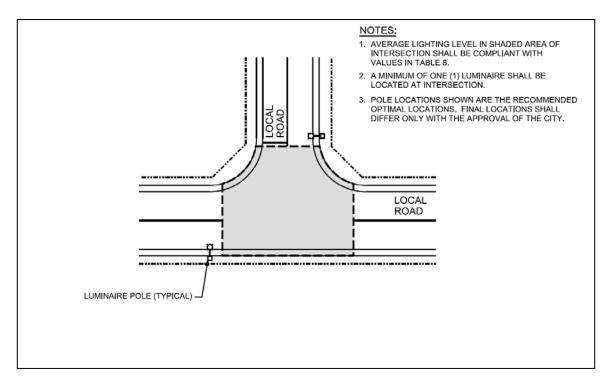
Typical 'T' Intersection of Local Road and Local Road
